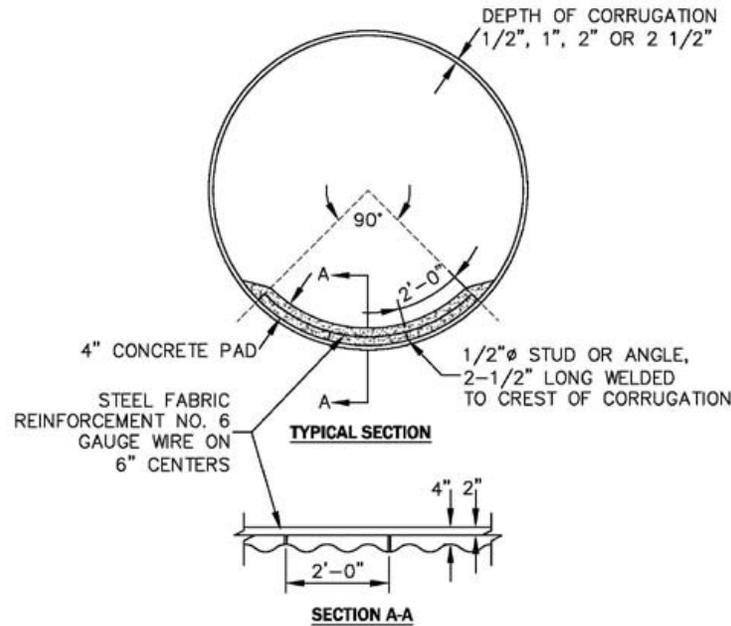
In-place installation of a concrete invert (U.S. DOT, FHWA, 1995)
